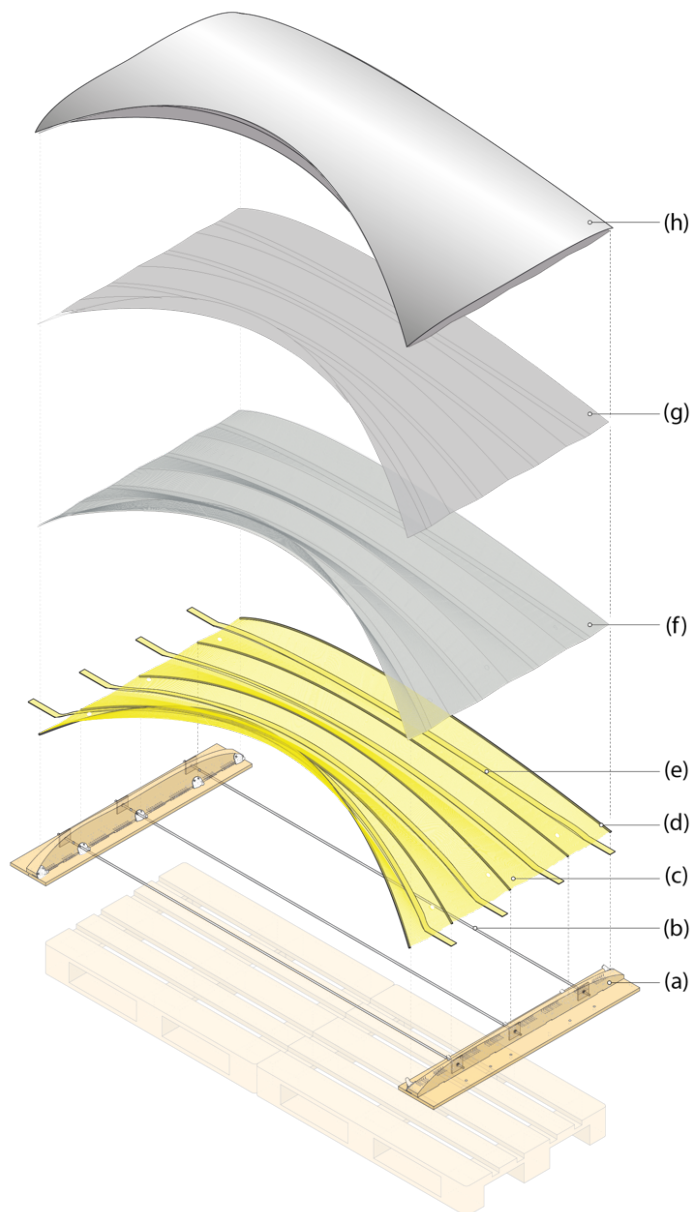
Exploded view showing the layered formwork concept: (a) timber edge supports; (b) threaded-rod ties; (c) 3D knitted textile; (d) bending-active rod; (e) tensioning ribbon; (f) cement-paste coating; (g) mortar; and (h) structural concrete.
